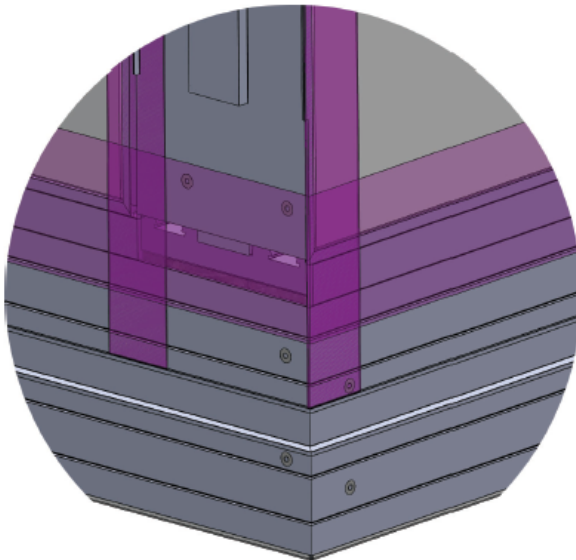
WALLS TO FLOOR HORIZONTAL AND VERTICAL TAPE DETAIL
